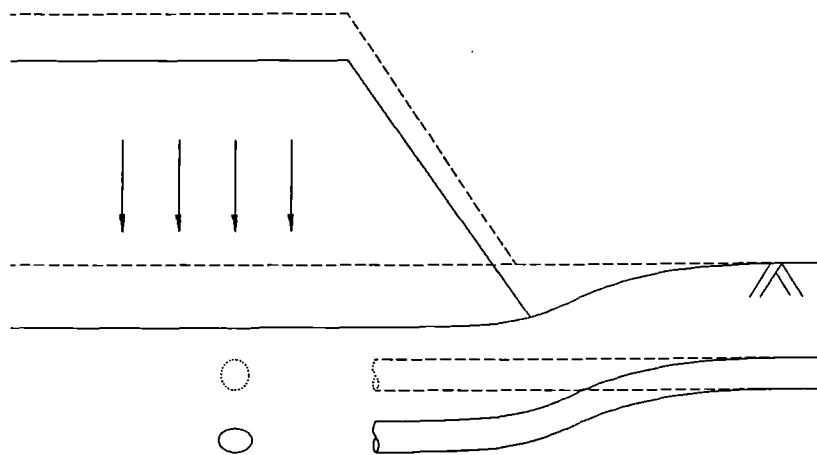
Ground and pipe deformation due to embankment construction.
